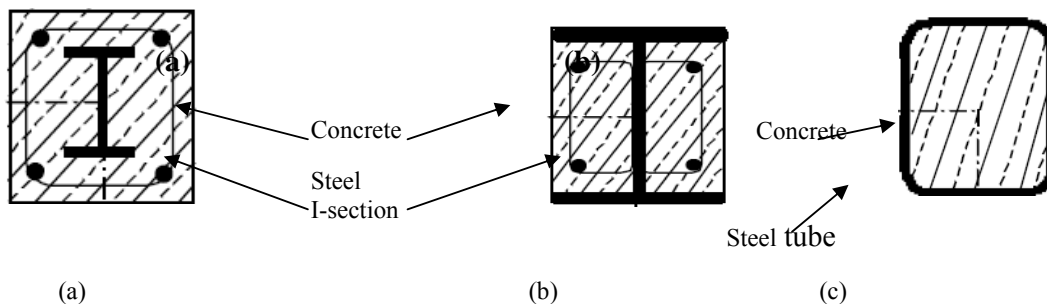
Typical cross-sections of (a) Fully encased composite column (FEC), (b) Partially encased composite column (PEC) and (c) Concrete filled tubular sections (CFT)
